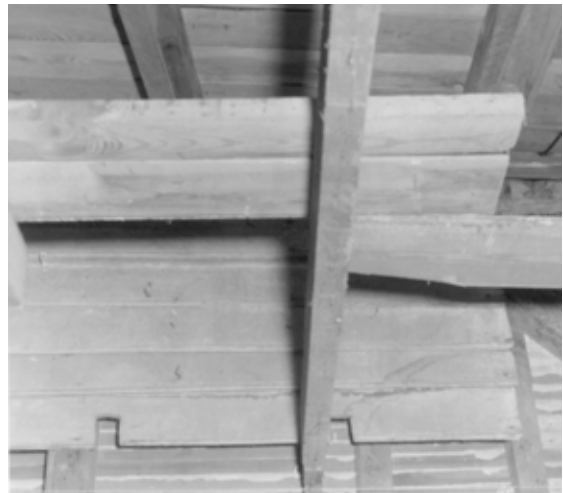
View of original beaded siding found above ceiling of Room 103, November 1965. VICK Coll.
